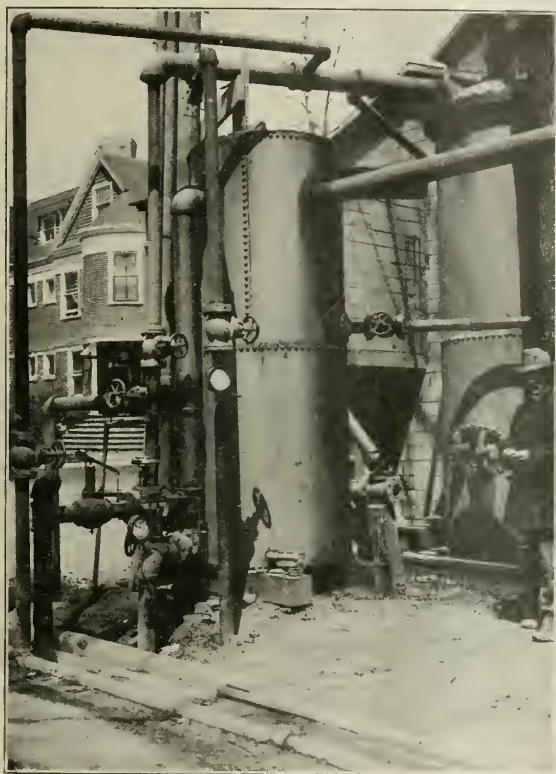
Evanston Sewer. Air Receivers, Having Automatic Check Reducing Valves on Outlet Pipes Leading to Three Separate Shafts. Valves Maintain Even Pressure.
